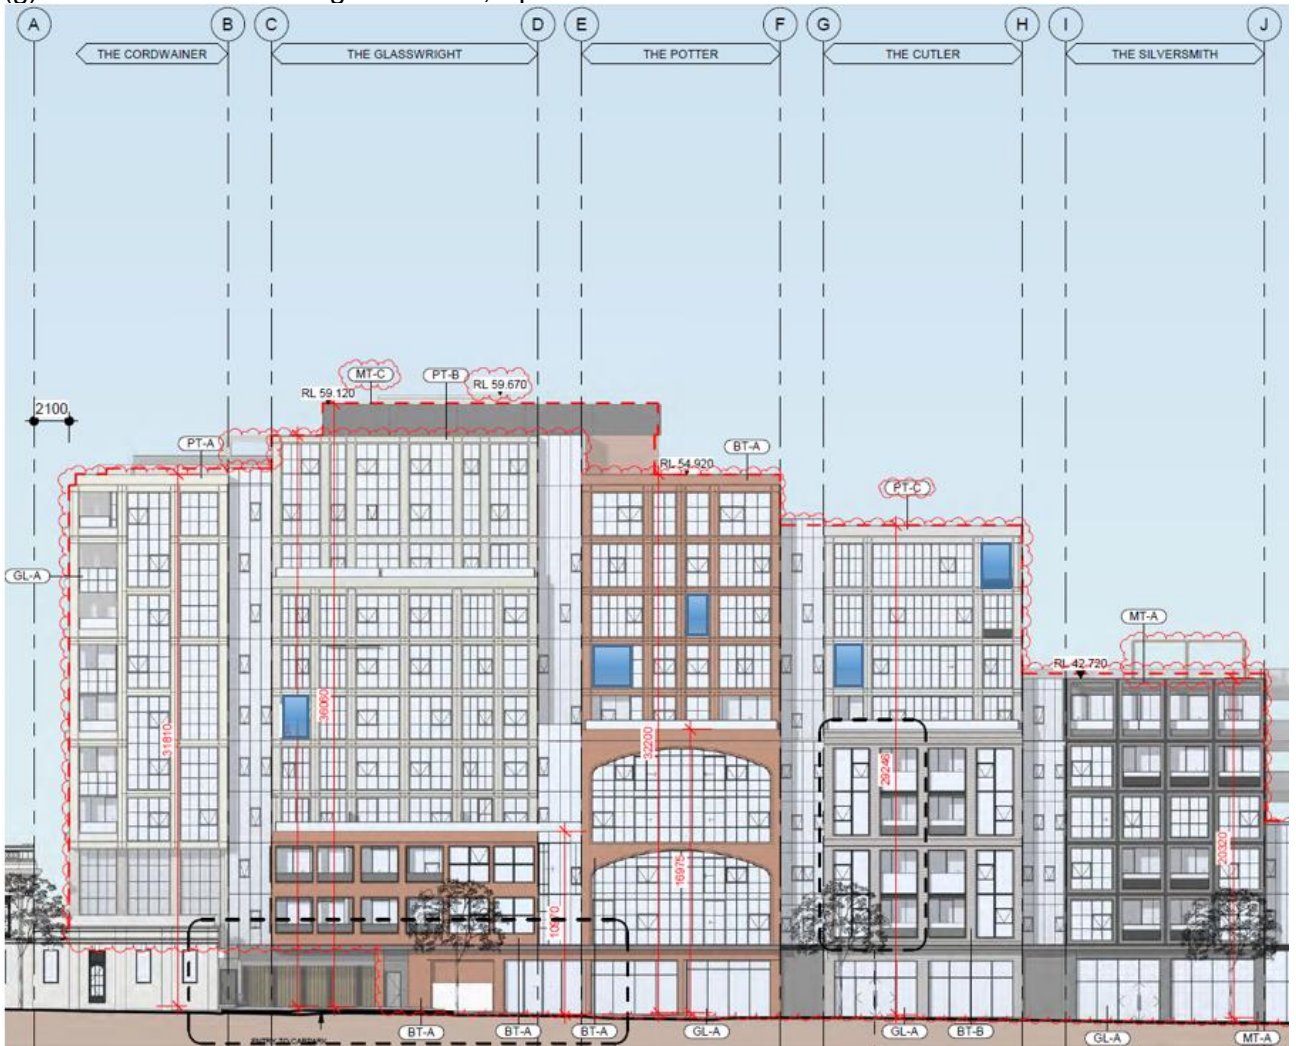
Balconies to be converted to winter gardens highlighted in blue on the east elevation (Grids A-J)
